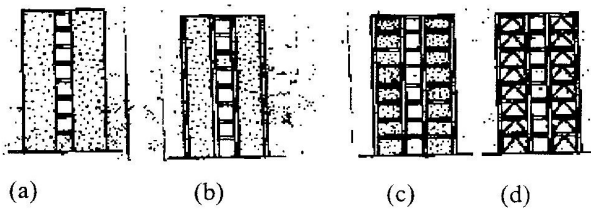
Lateral load resisting systems. (a) lateral load bearing shear wall (b) shear walls with columns. (c) In filled shear walls. (d) braced frames.
